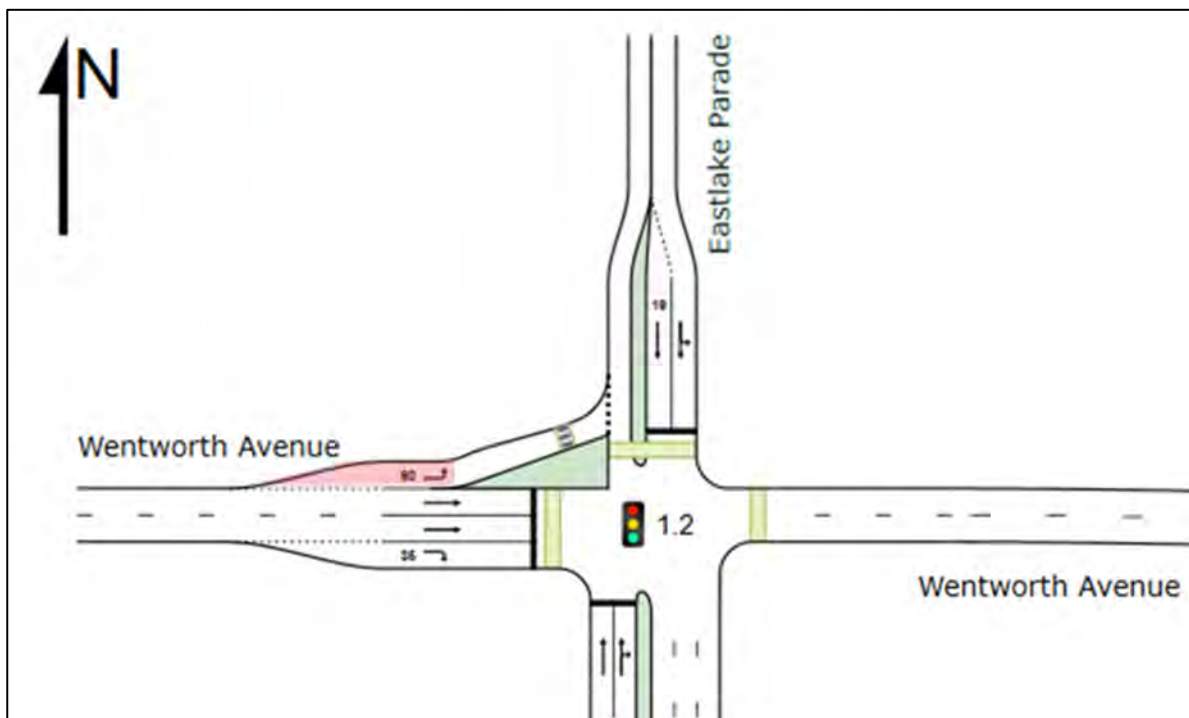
Proposed upgrade at Wentworth Avenue / Eastlake Parade / Telopea Park intersection (marked in red)
